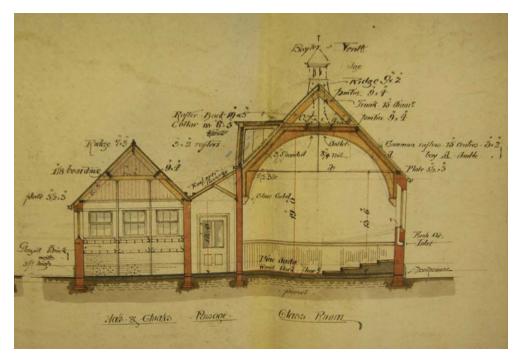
South-west facing section (C-D) through the proposed additions to the southwest end of the building (CRO(B) Z1041 1875-1904)
